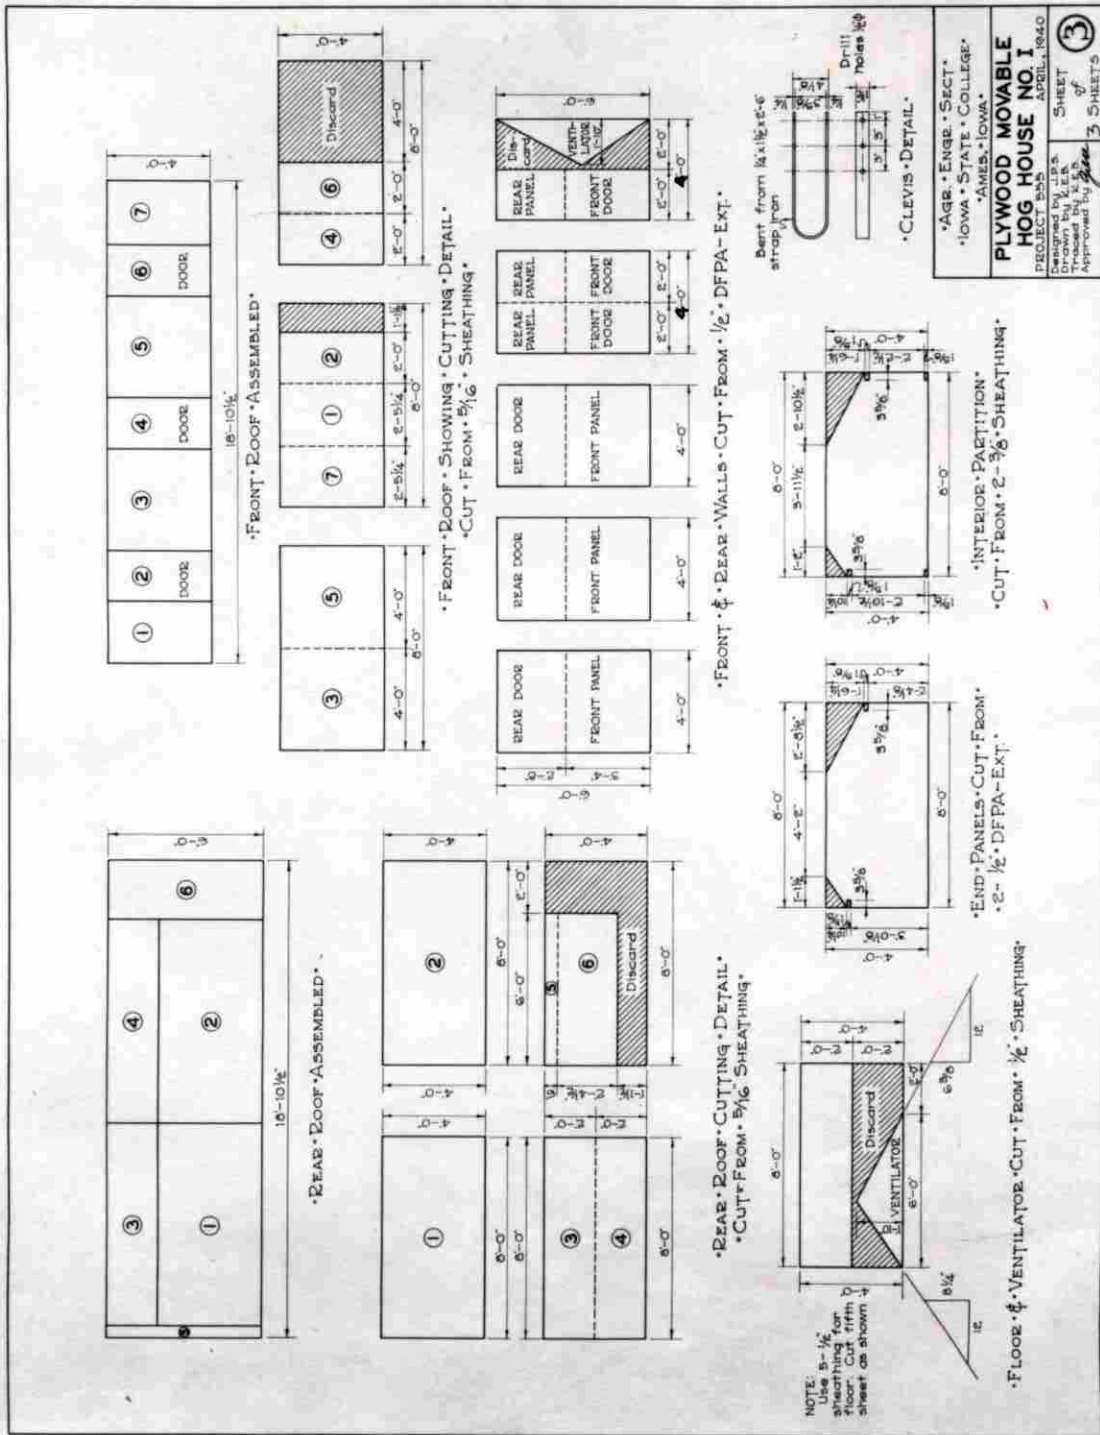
Design of Plywood Movable Hog House No. 1, continued
